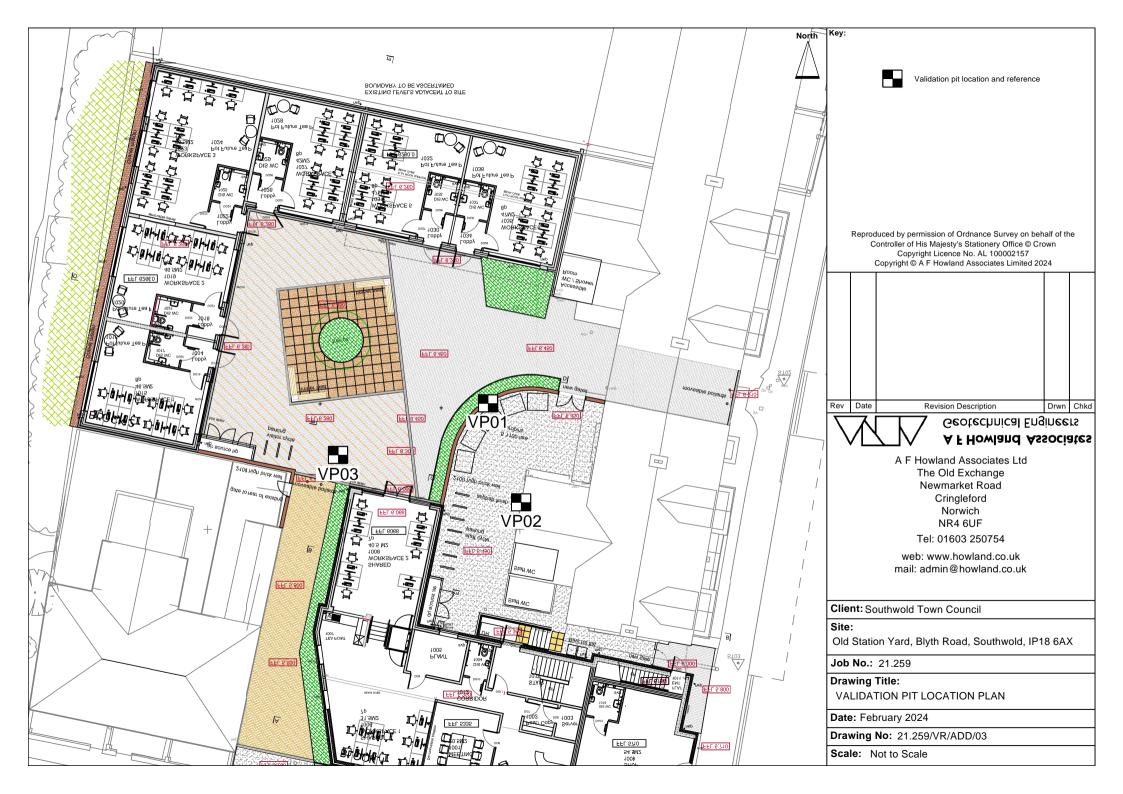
/01 Drawing 21.259/VR/ADD/02 Drawing 21.259/VR/ADD/03 Site Location Plan Vapour Monitoring Location Plan Validation Trial Pit Location Plan
